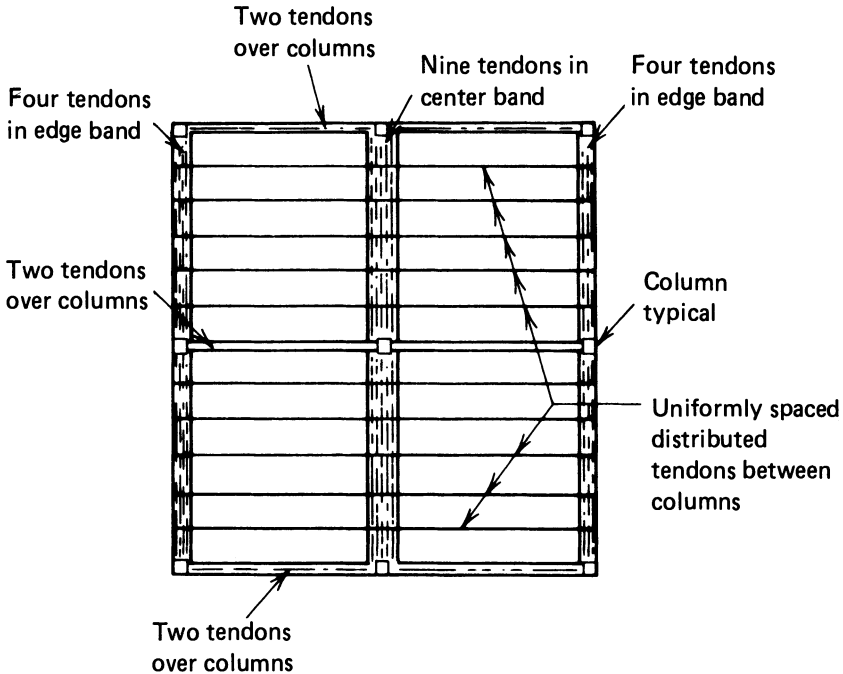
Plan of flat plate slab showing spacing of tendons using banded tendon distribution.
